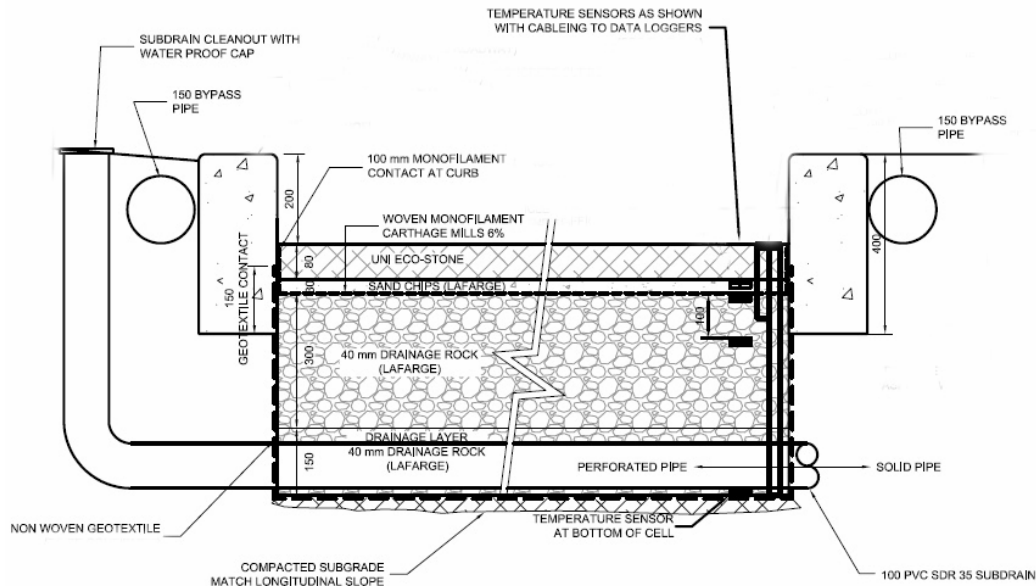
Currie Barracks Permeable Pavement Cross-Section (Eco-Stone® installation shown. Porous Asphalt installation is identical except for the surface course) (Courtesy Westhoff Engineering Resources, Inc.)
